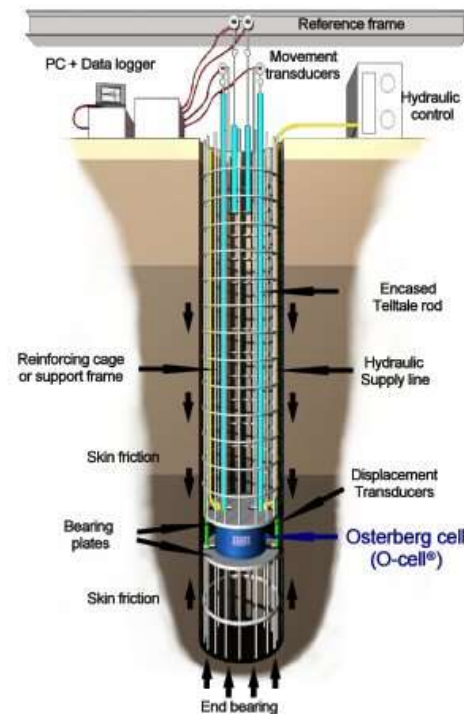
Typical Bi-Directional Static Load Test setup (from [www.loadtest.com](http://www.loadtest.com)).
